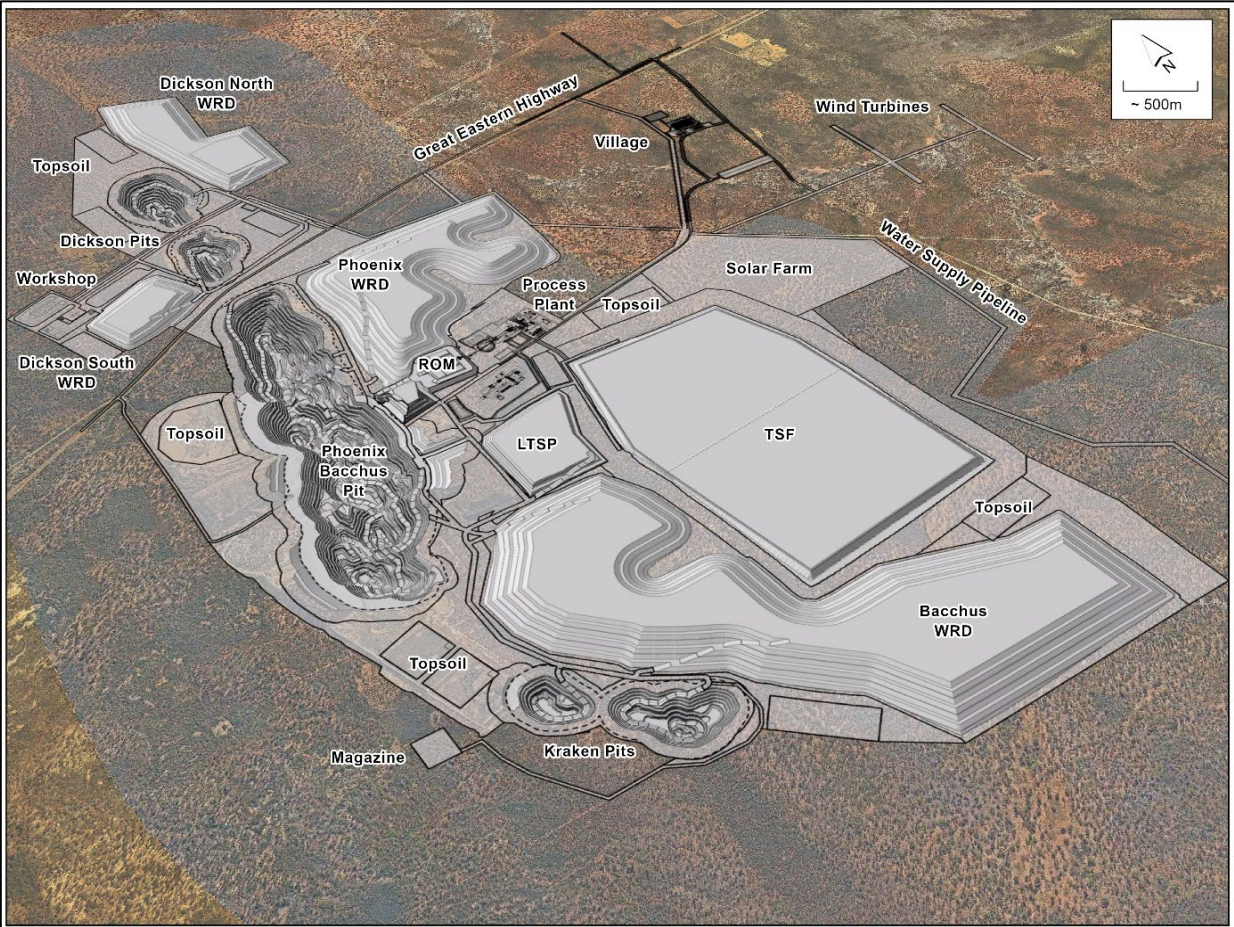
Conceptual overview of Bullabulling Infrastructure layout
